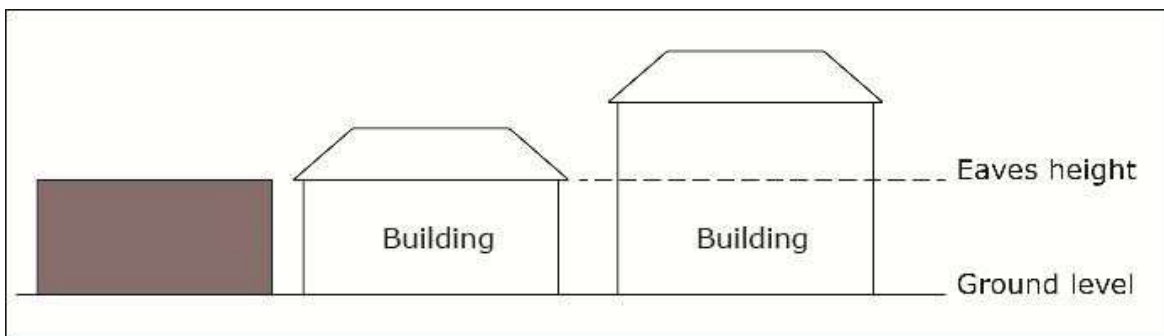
Eave height envelope for construction of an outbuilding to a contributory or not contributory property; pergola/verandah to a contributory or not contributory property (see 2.6 below); and shade sail to all properties (see 2.8 below).
